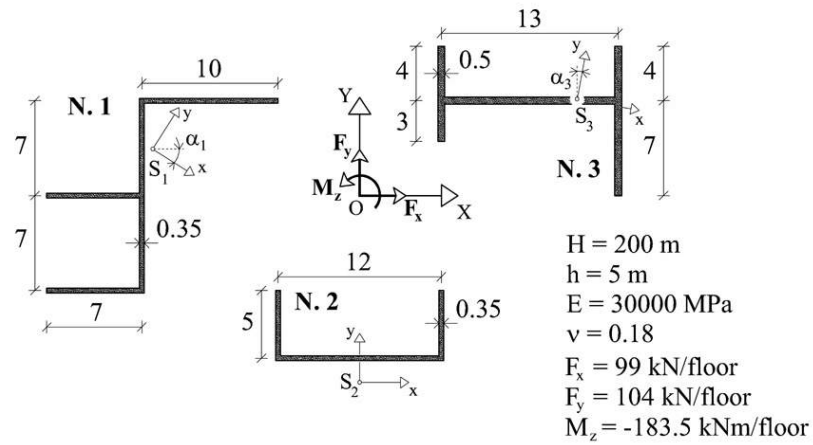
Internal core system of a tall building constituted by thin-walled open section shear walls (measures in metres).
